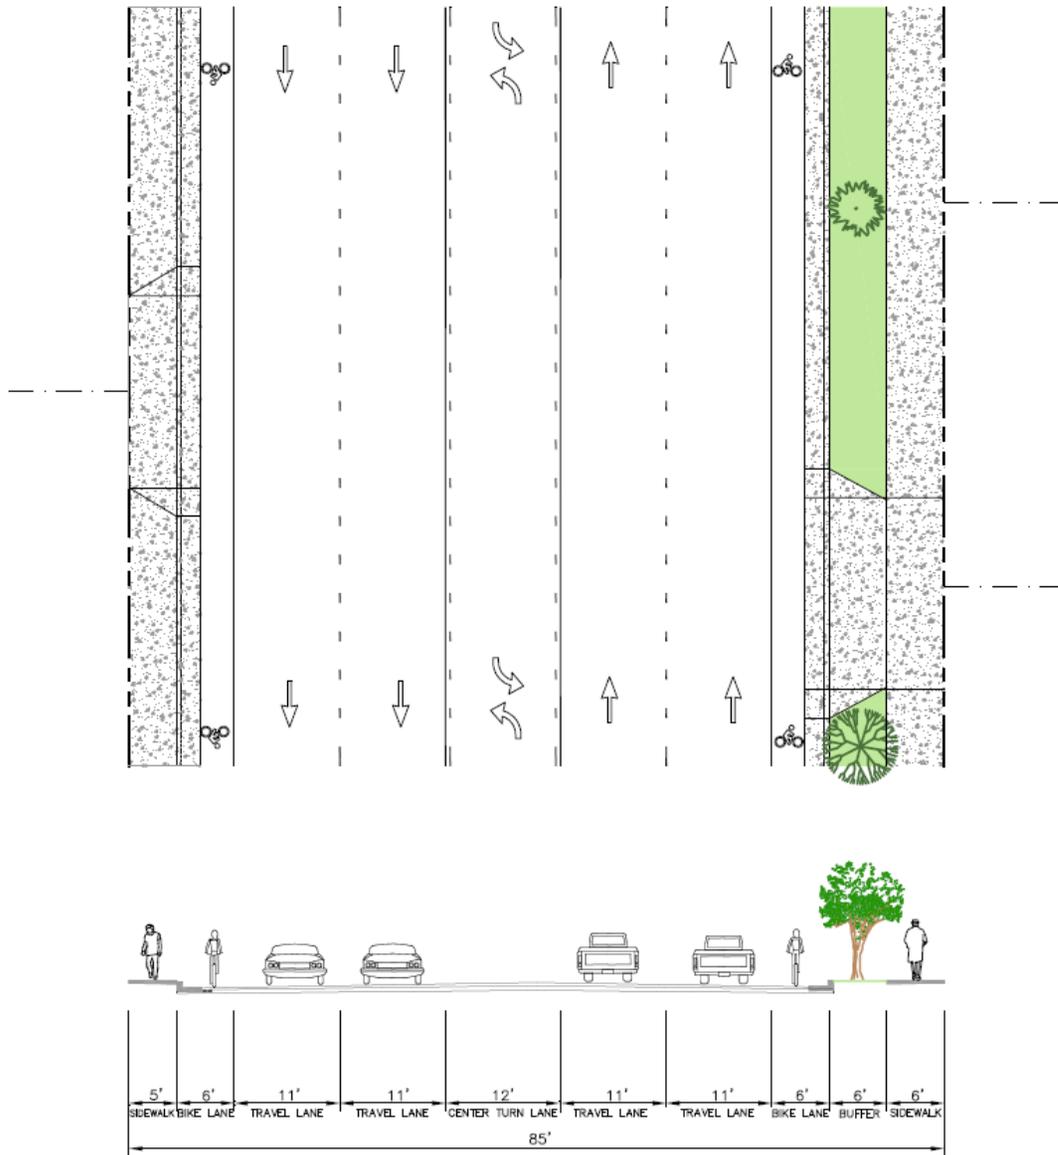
Proposed Louisiana Blvd. Cross Section
